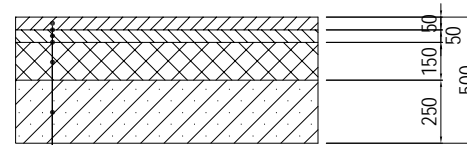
DETAIL OF ASPHALT CONCRETE PAVEMENT S=1:30
